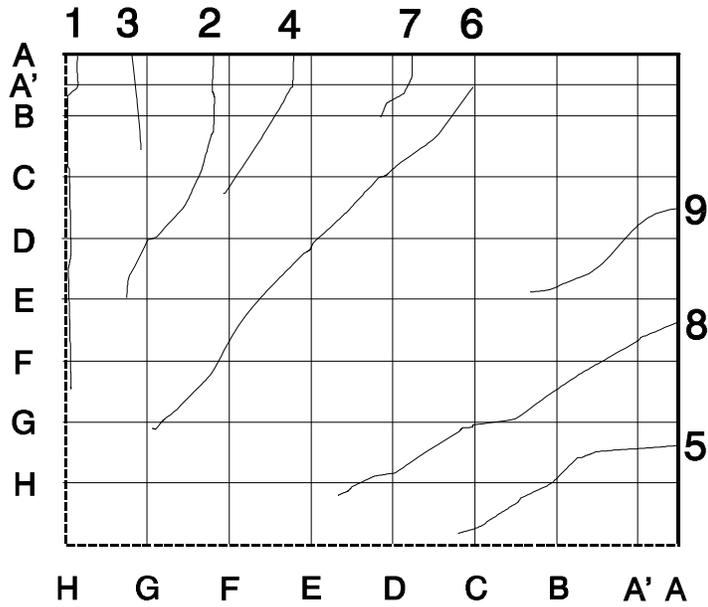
POJ-RC-100-TH cracking pattern on south face of joint at dead load
